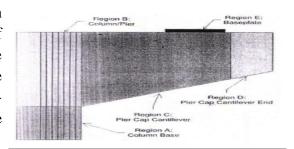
Indicating the elements of the bridge like cantilever, pier cap etc.
